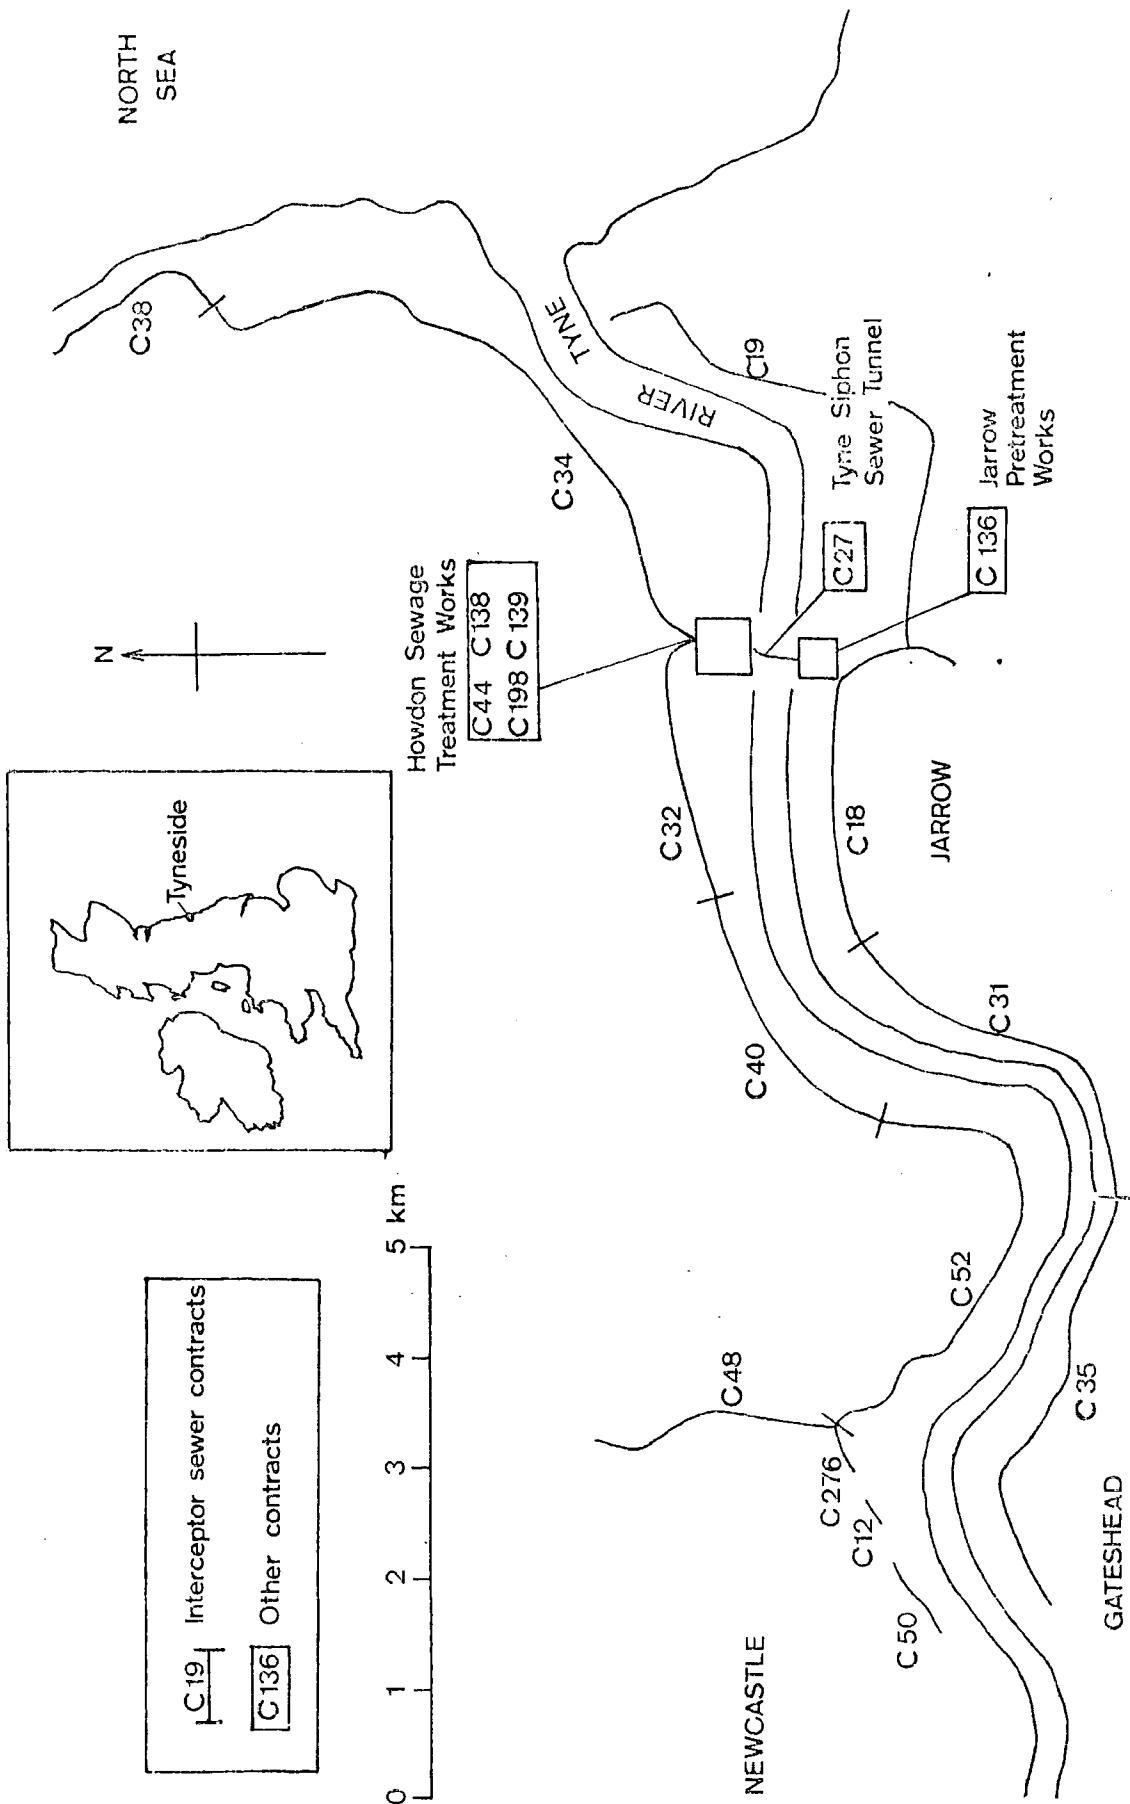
TYNESIDE SEWERAGE SCHEME - LOCATION PLAN
